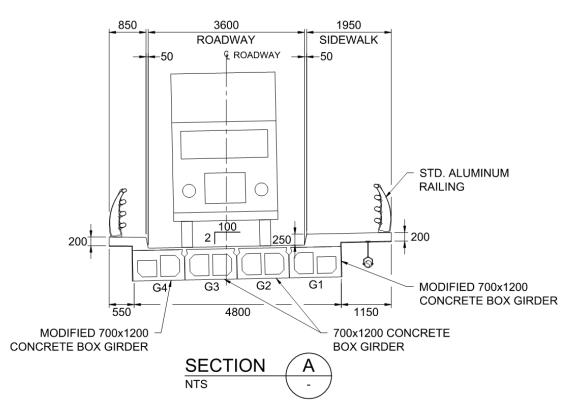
Bayview Place Bridge over Alberta Creek – Section
